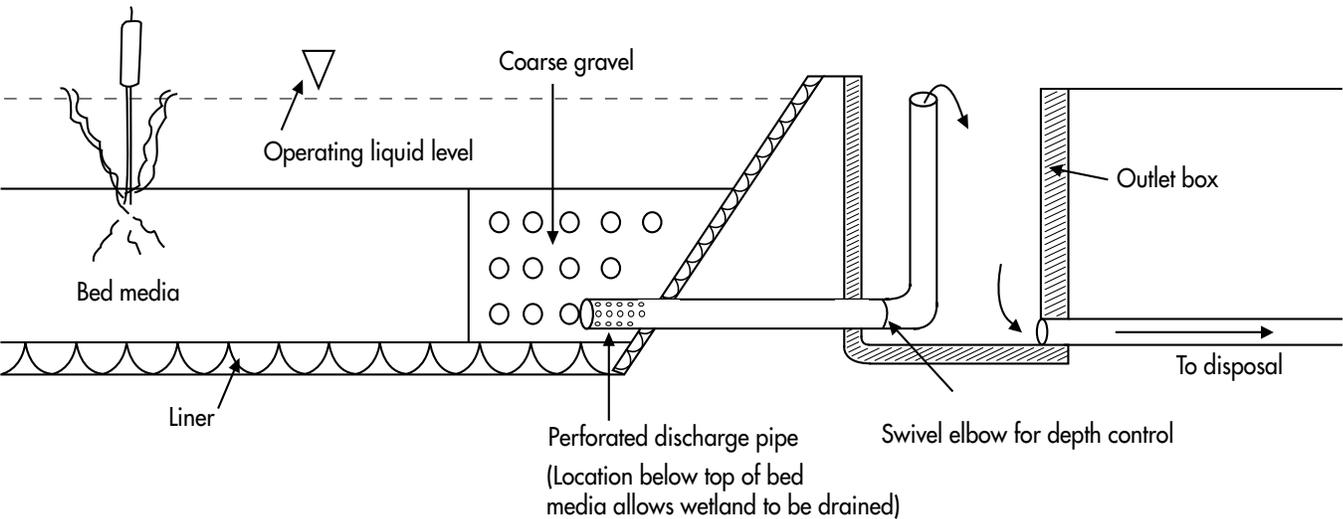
Constructed Wetland - Outlet Option / Detail Cross Section
